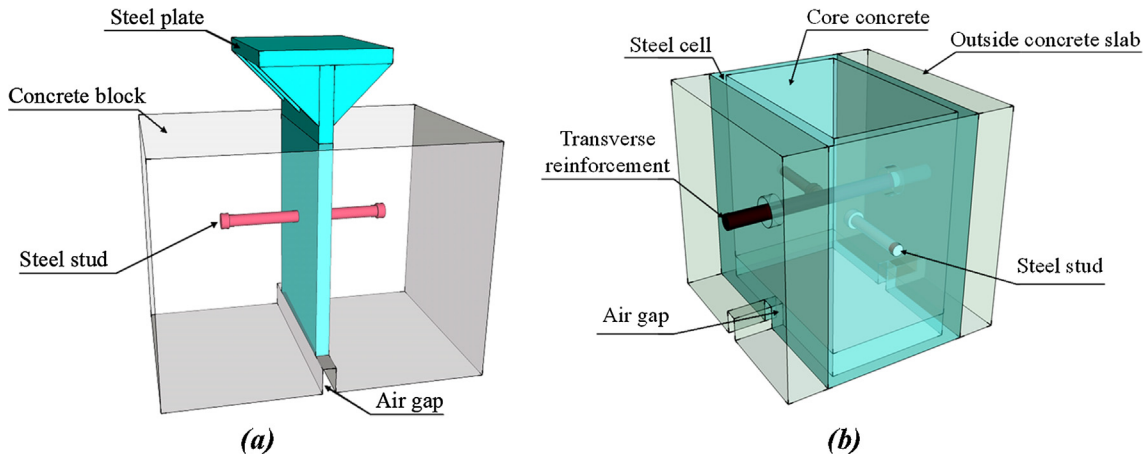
Structural Layout of Push-Out Specimens: (a) Schematics of Plug-In Specimen Layout; (b) Schematics of CFSC Specimen Layout.
